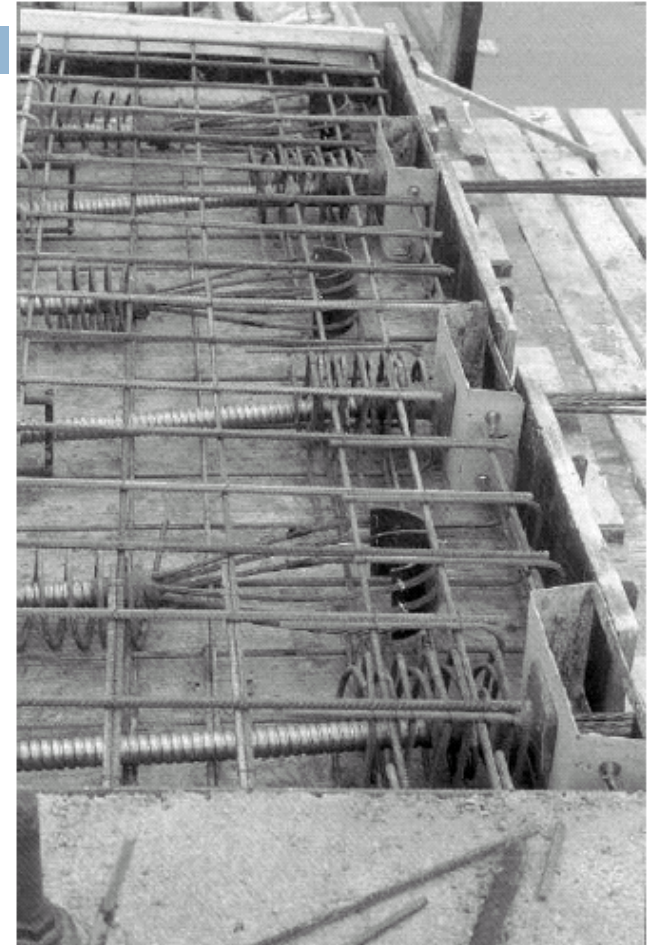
Anchorages provide for the safe introduction of post-tensioning forces into the concrete.
